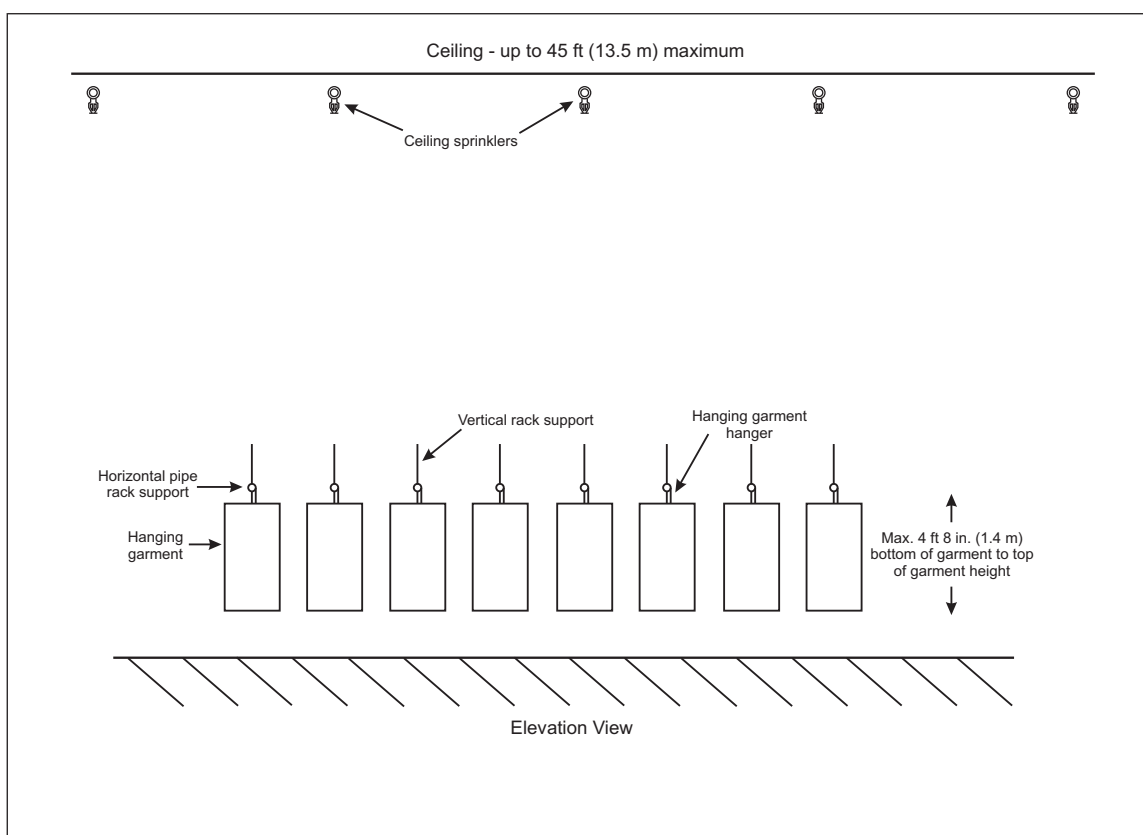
Ceiling-only protection, maximum 45 ft (13.5 m) ceiling and maximum 5 ft (1.5 m) storage height
